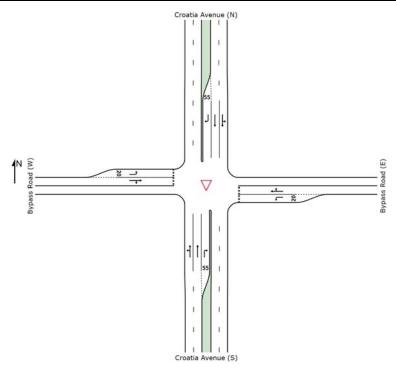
2026 Croatia Avenue/ Bypass Road Layout
